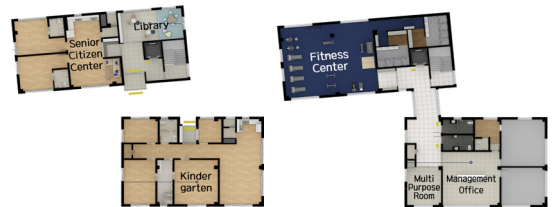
Community center floor plan 1st / 2nd Floor [14]
